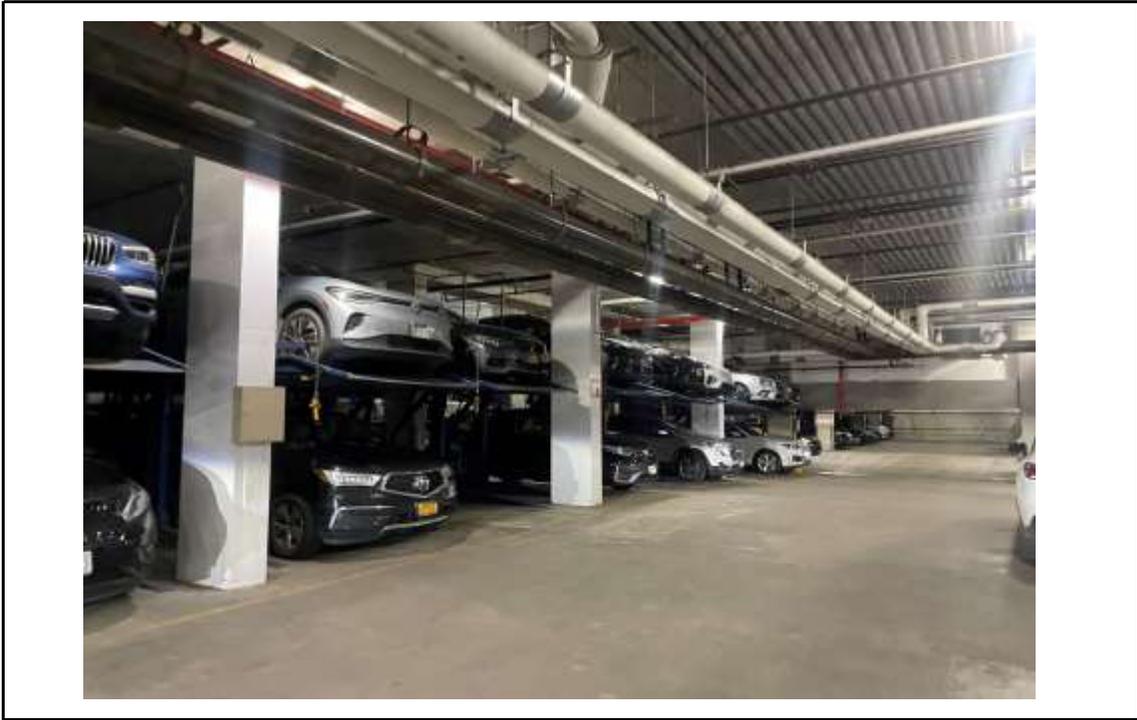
Subgrade parking garage concrete slab, facing southeast. 05 December 2023.
